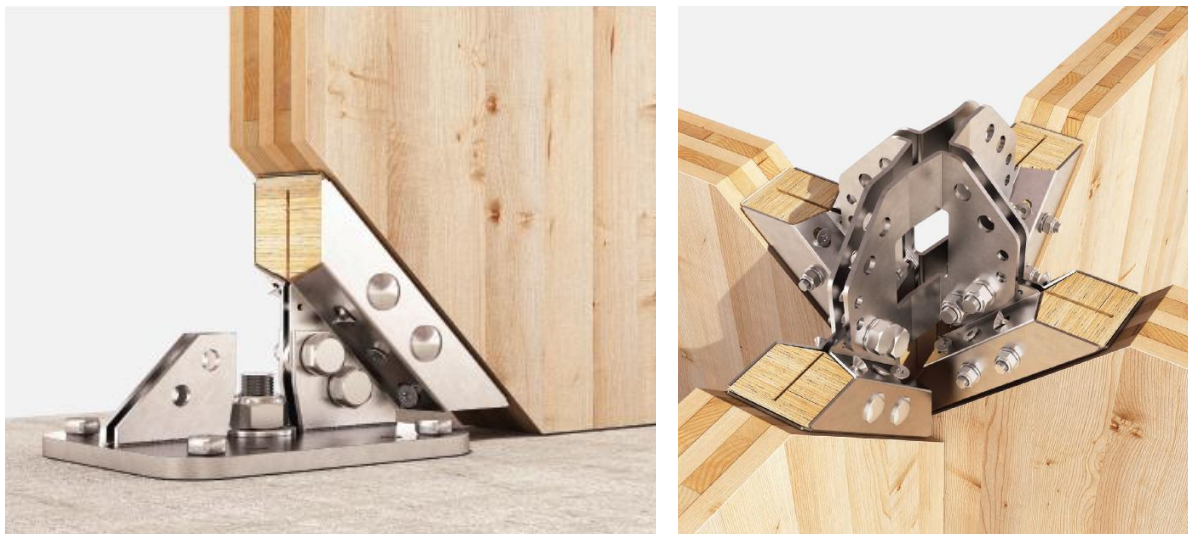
Examples of special plates design to connect the walls: wall-foundation joint (left) and 4-way joint (right).
